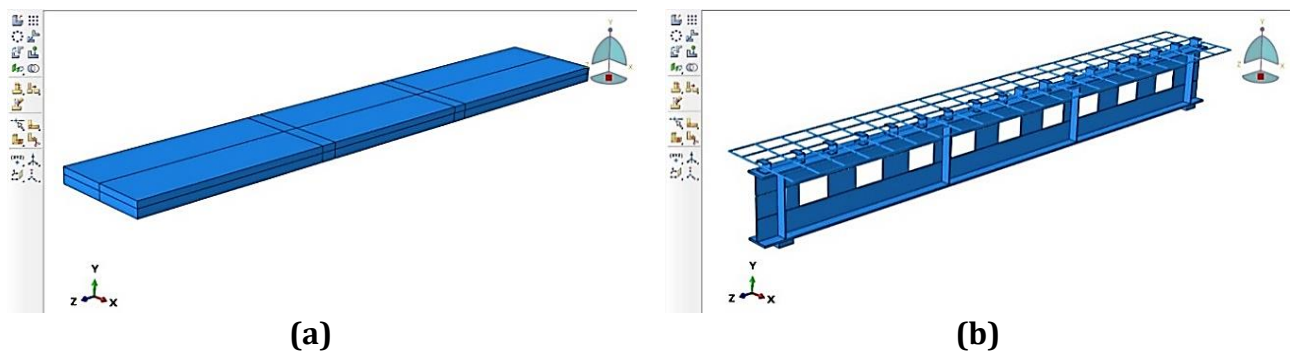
Finite element idealization of composite concrete-asymmetrical steel section with expansion web (a) concrete desk slab (b) steel sections and rebar
